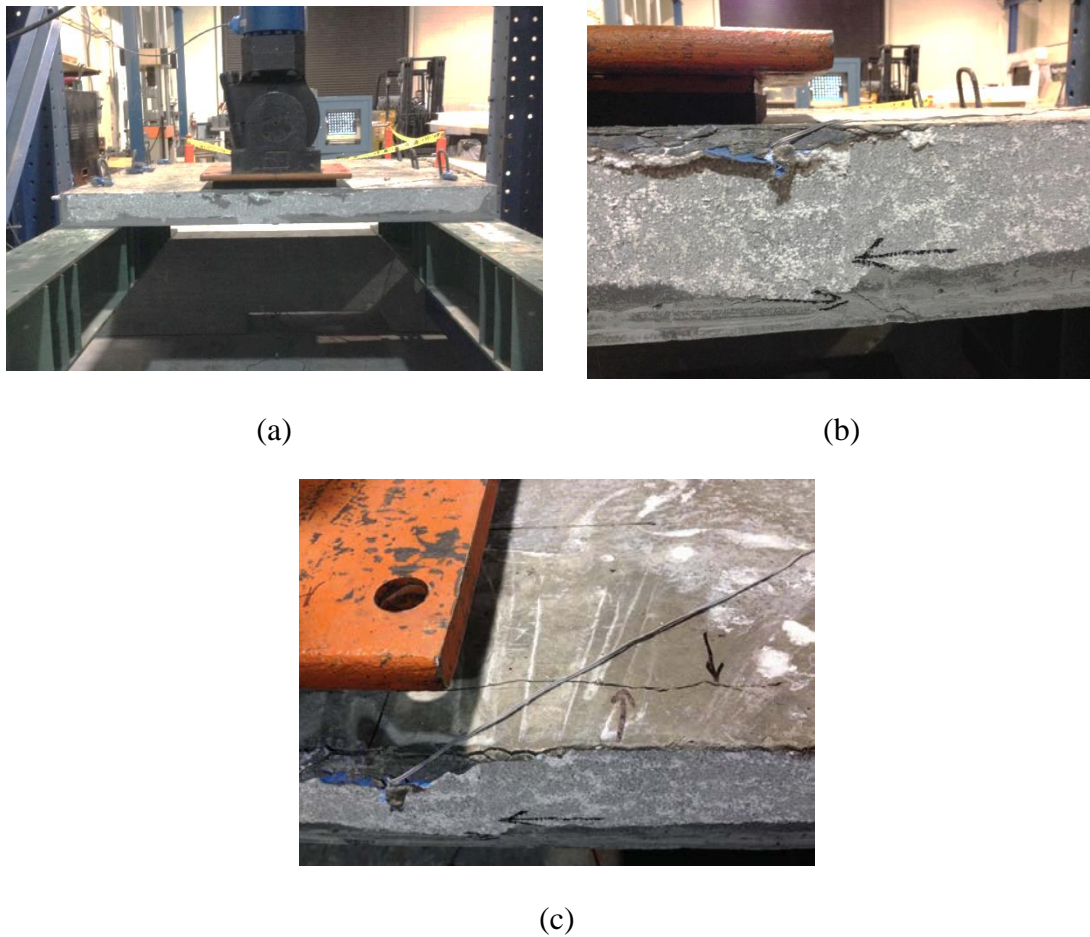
Punching Shear Test of Specimen 4T1S: (a) Test Setup, (b) Beam Shear Crack, and (c) Cracks on the Top of the Slab
